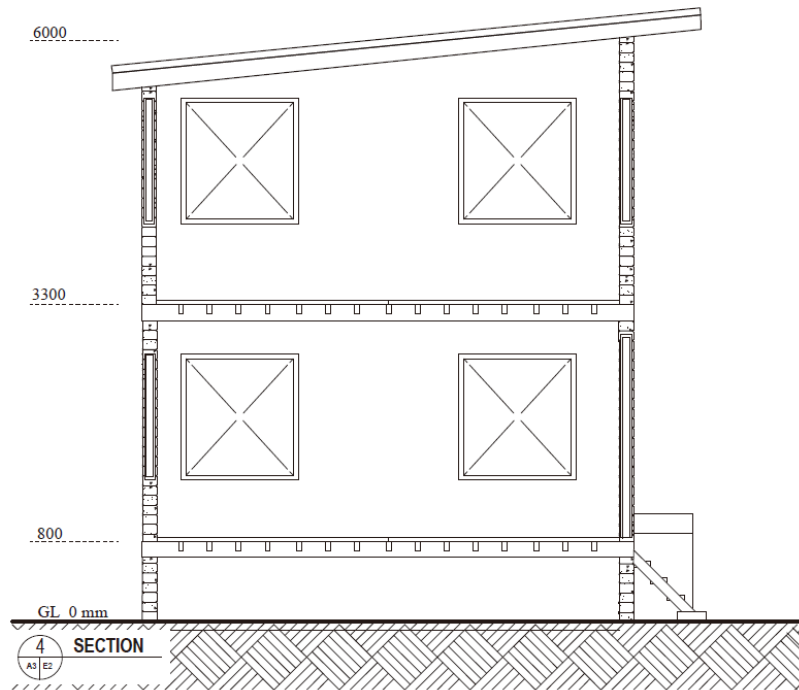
53: Sectional view of house (Source: University of San Carlos)
